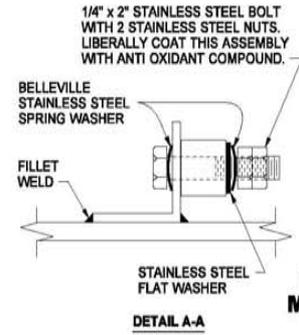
PHOTOCELL ENCLOSURE MOUNTING DETAIL
